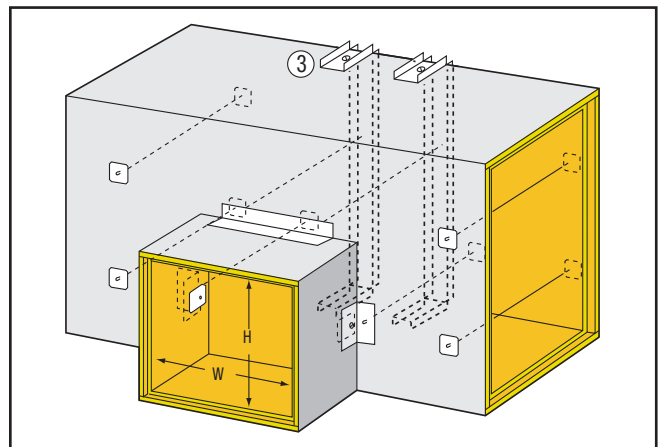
C. Trunk Duct Reinforcement With 3" (76mm) Channels
